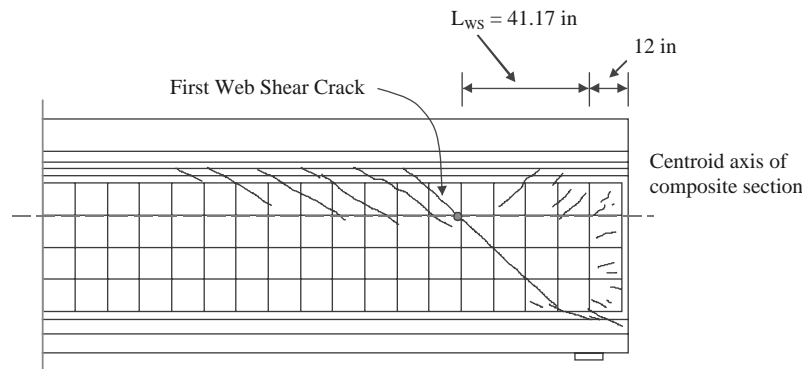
Location of first web-shear cracking at east end of Girder 1.
